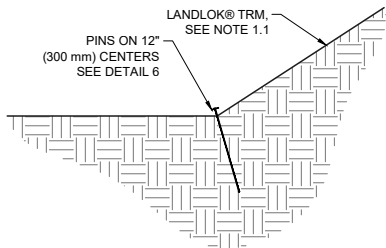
CREST OF SLOPE (COS) TRENCH
